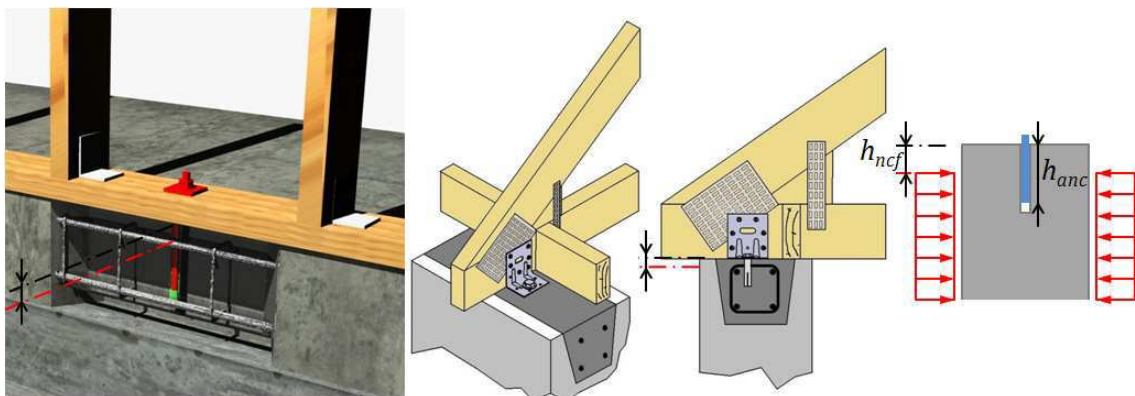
Example of two types of mechanical anchorage for wooden components of usual building in reinforced concrete ties.
